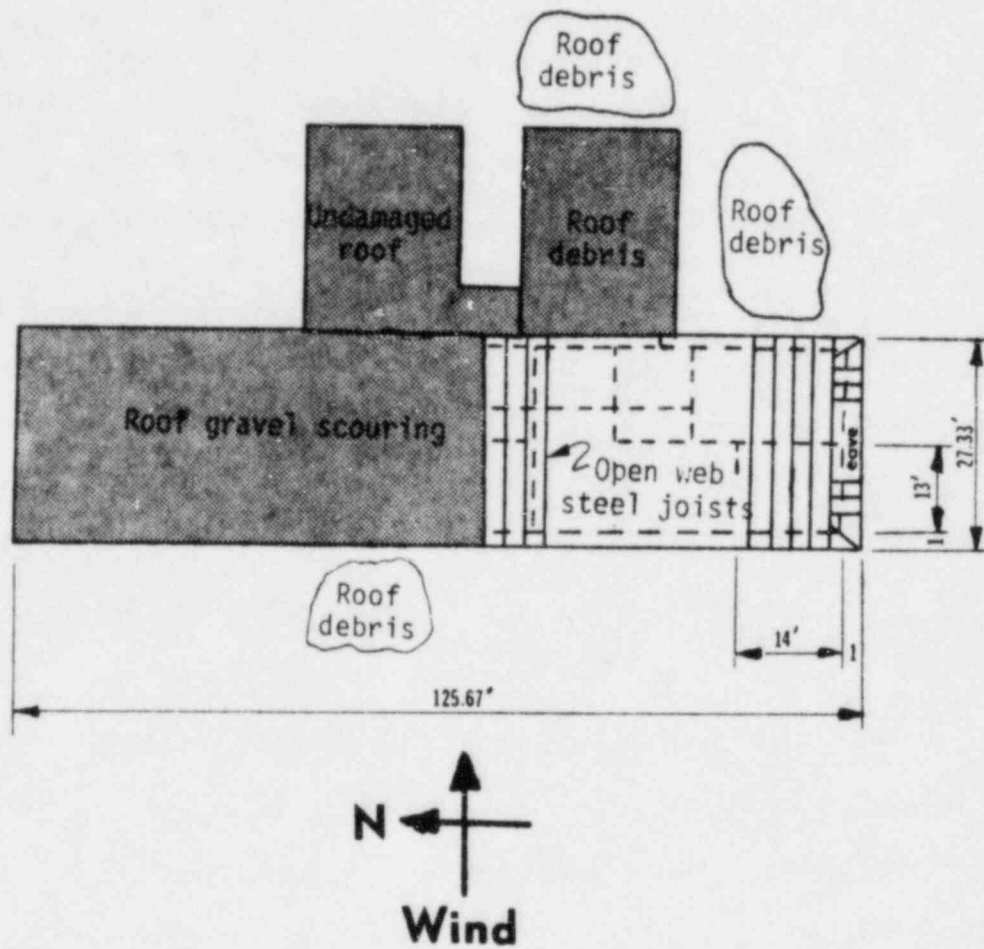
ROOF PLAN OF COMMUNICATIONS BUILDING (damaged area is unshaded).
